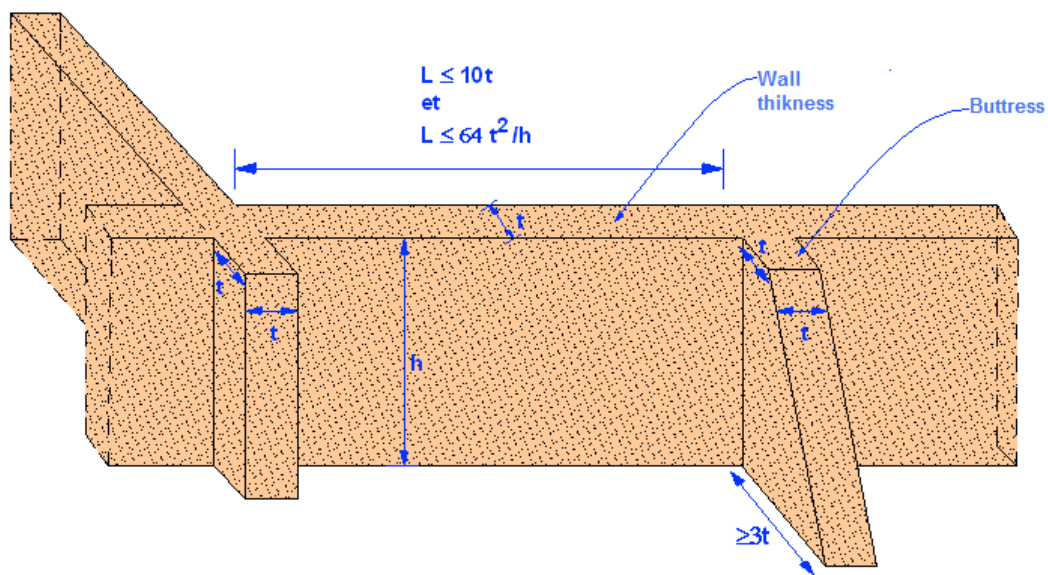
Some geometrical specifications according to Guidelines for Wall Construction with Buttresses and Pilasters, (IAEE, 1986).
